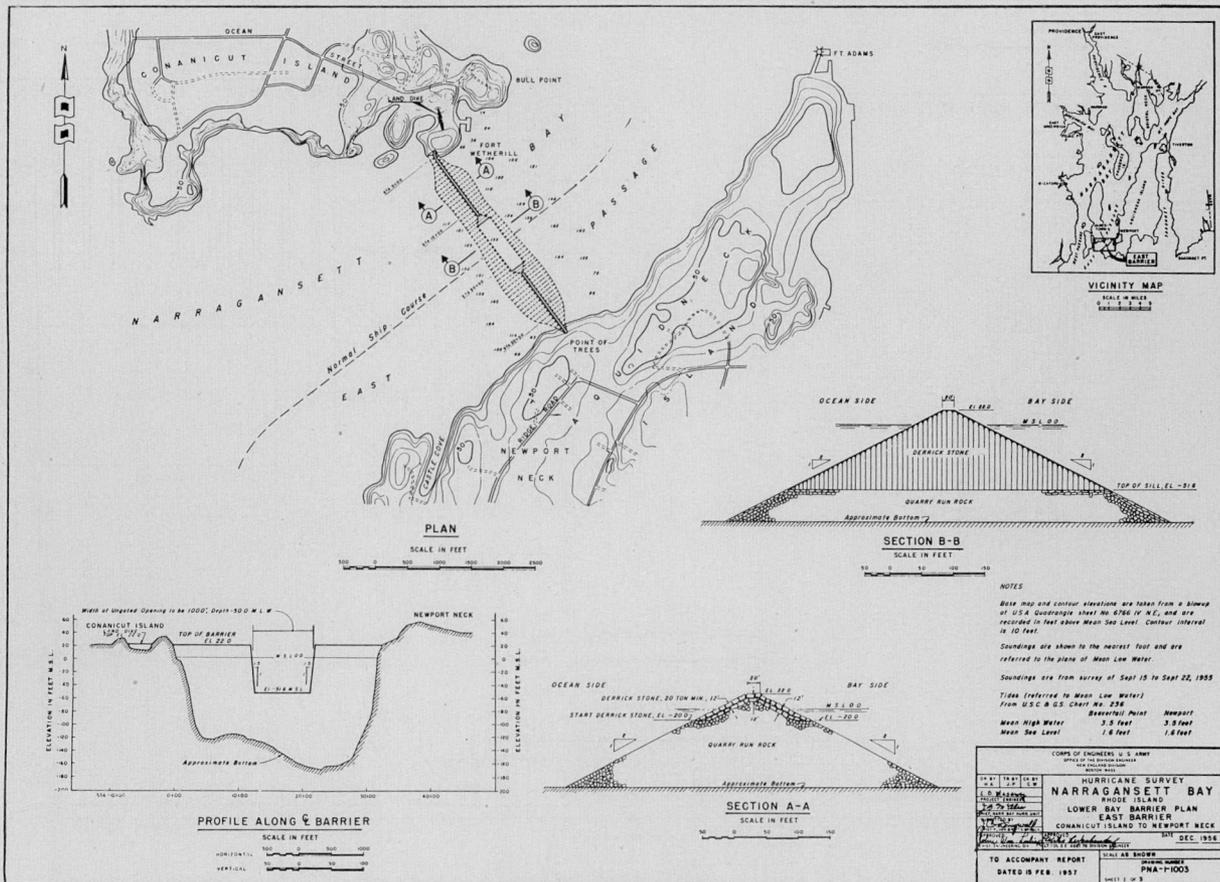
Lower Bay Barrier Plan, East Barrier.
